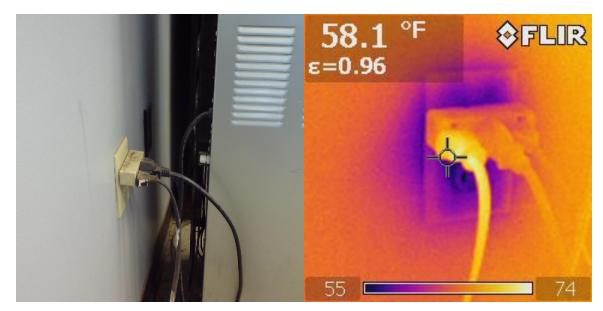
Infiltration Detection—Electrical Outlet on Exterior Wall
